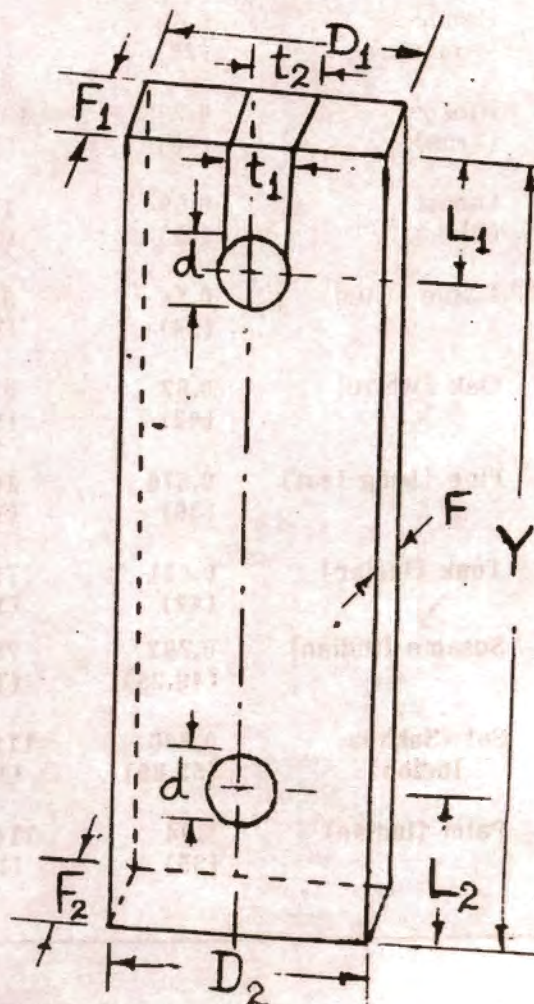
FIG. IV SPECIMEN FOR EDGE SHEAR TEST
